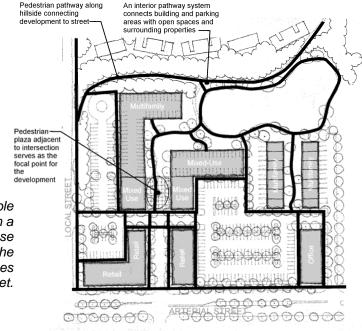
Example pedestrian network in a large scale mixed-use development – note the connections between uses and to the street.
